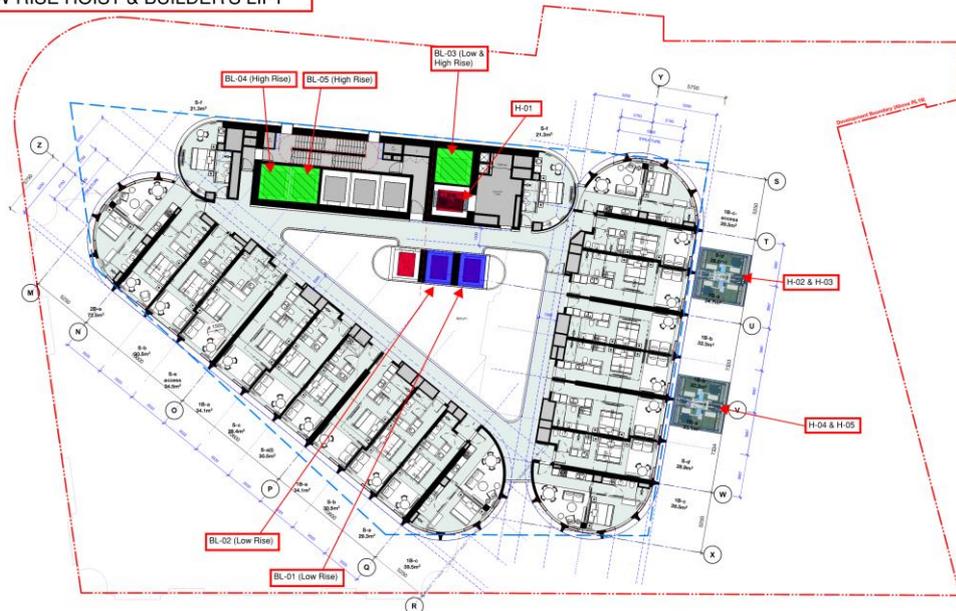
Hoist and Builders Lift Draft layout
